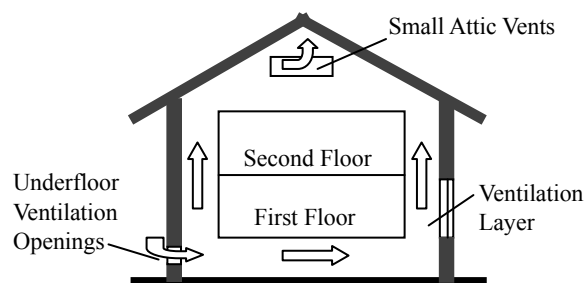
Schematic Drawing of Vertical Section of a House where has a Ventilation Layer between the Outside and the Inside of wall by Outer Wall Insulator Design
